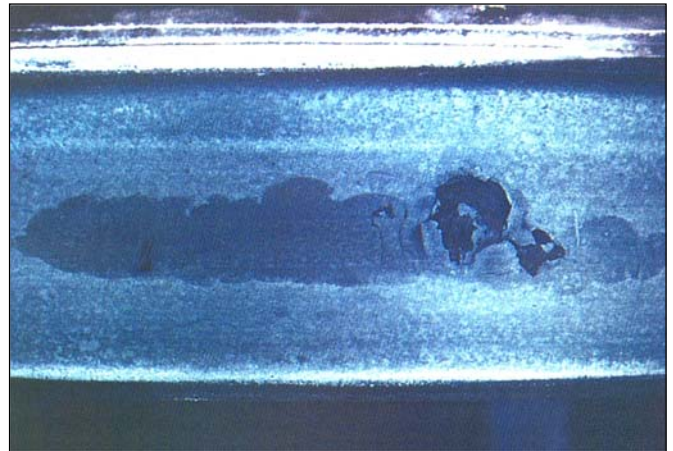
Typical Brake-Related Spalling showing Etched Martensite
